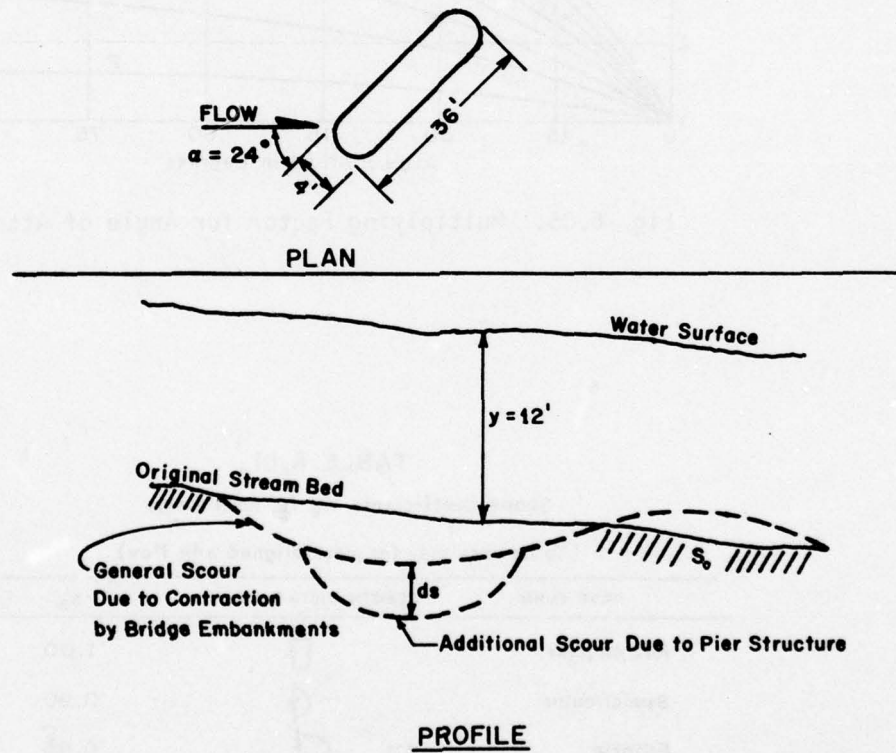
Scour at Bridge Piers and Other Obstructions
